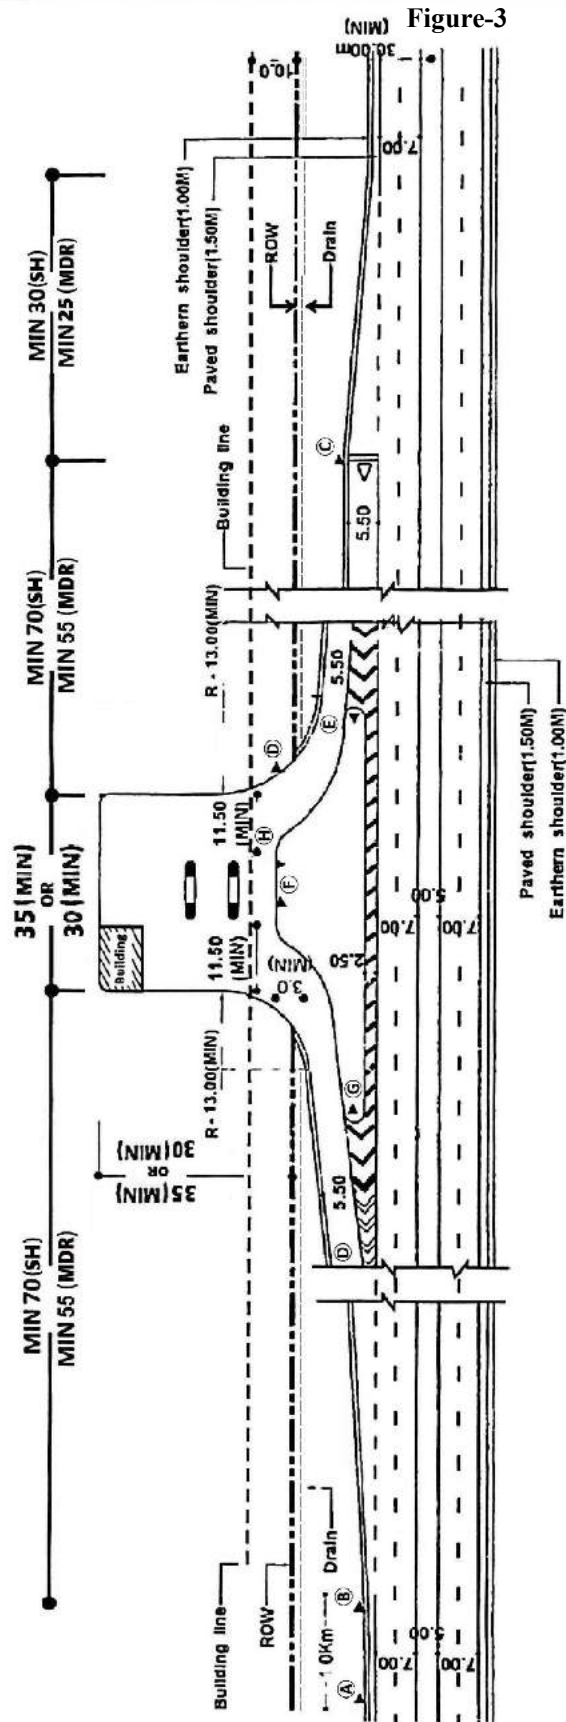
ACCESS TO FUEL STATION ON UNDIVIDED CARRIAGEWAY
